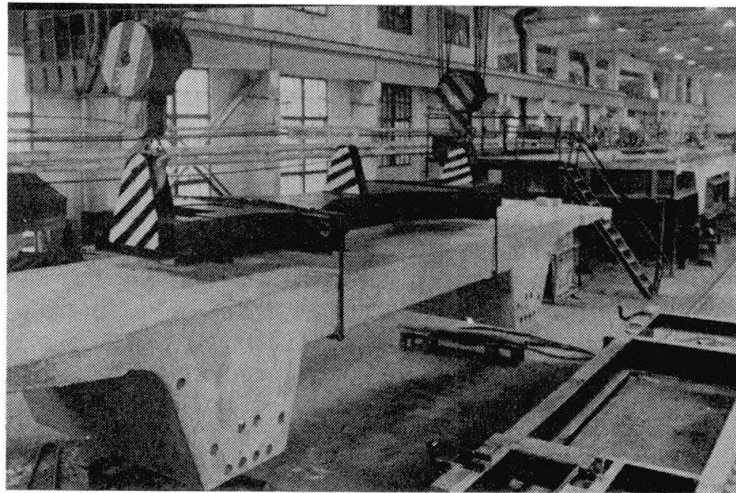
South Bridge - Inside view of the precasting factory. Short-line precasting segment "PRK".
